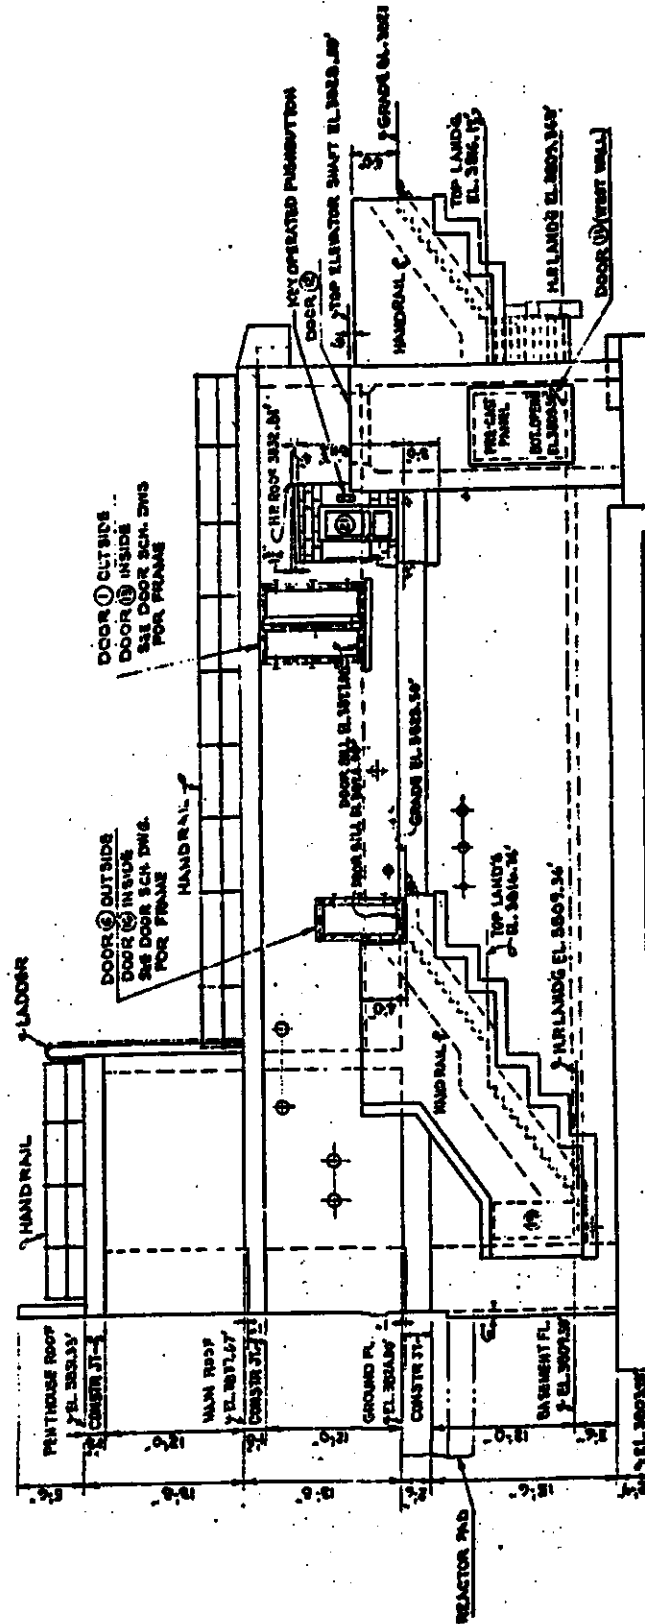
Test Cell C, Building 3210, west elevation, ca. 1960.
